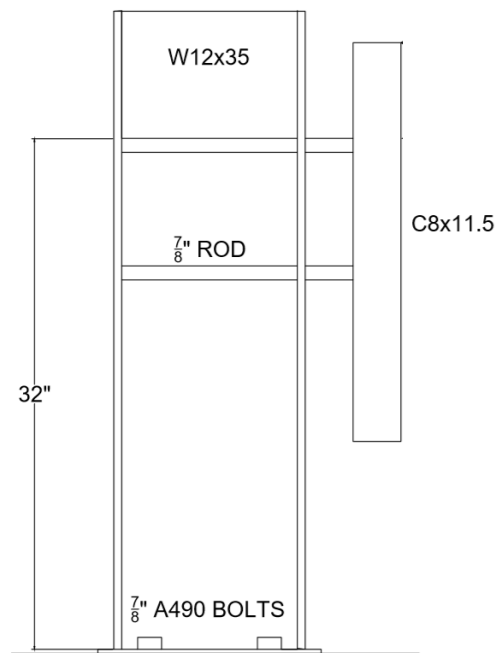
Modified bracing for Test 3 and Test 4
